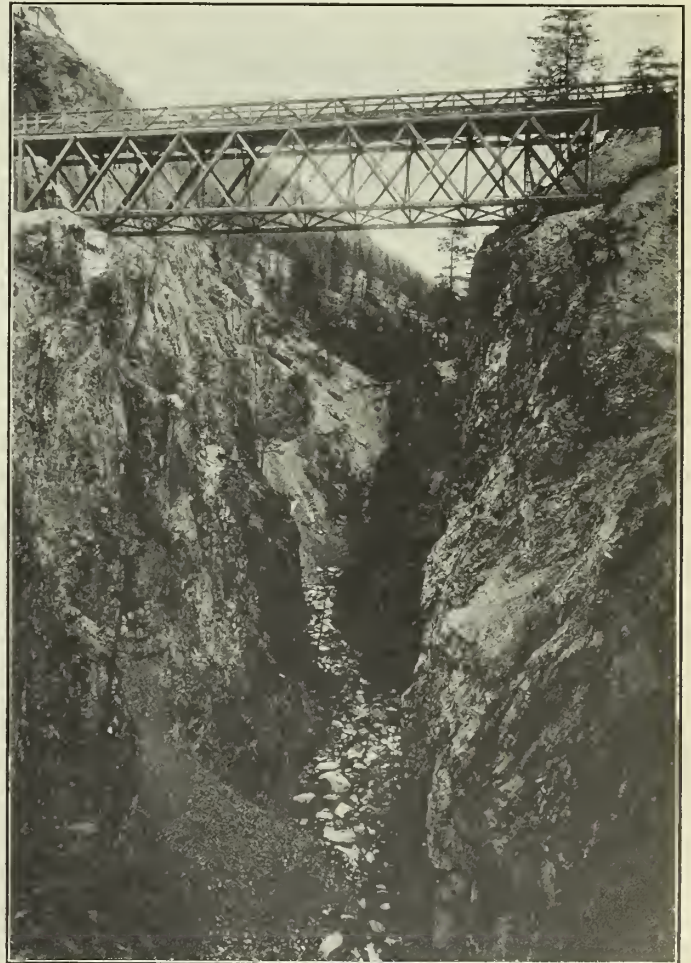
Cisco Bridge—180 feet above bed of Creek—
